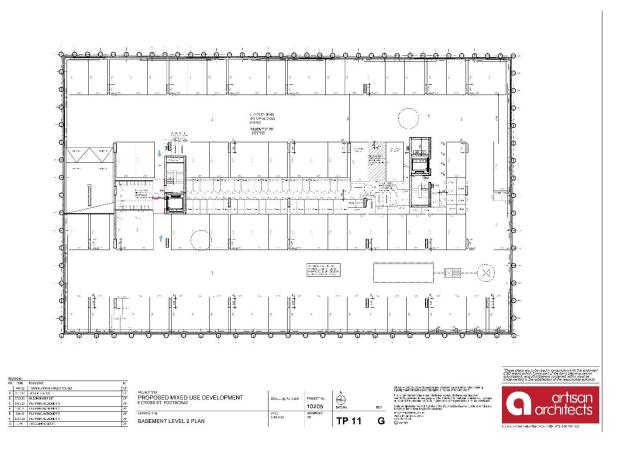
Parking Layout: Basement Level 2 (plan No. TP 11 G by artisan architects)
